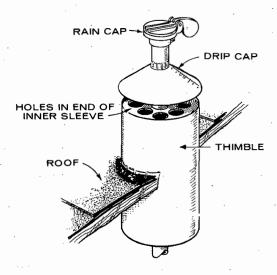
TYPICAL EXHAUST PIPE THIMBLE
